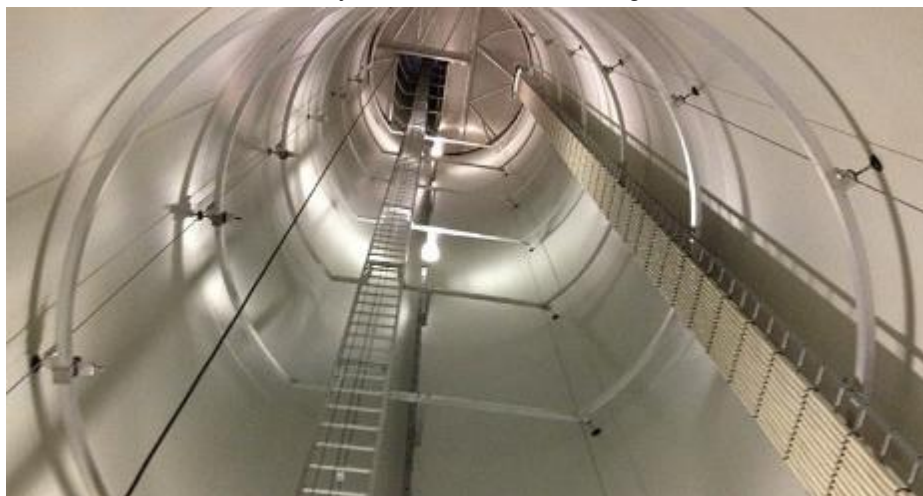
Tower internals, courtesy of Steel Wind Tower.
